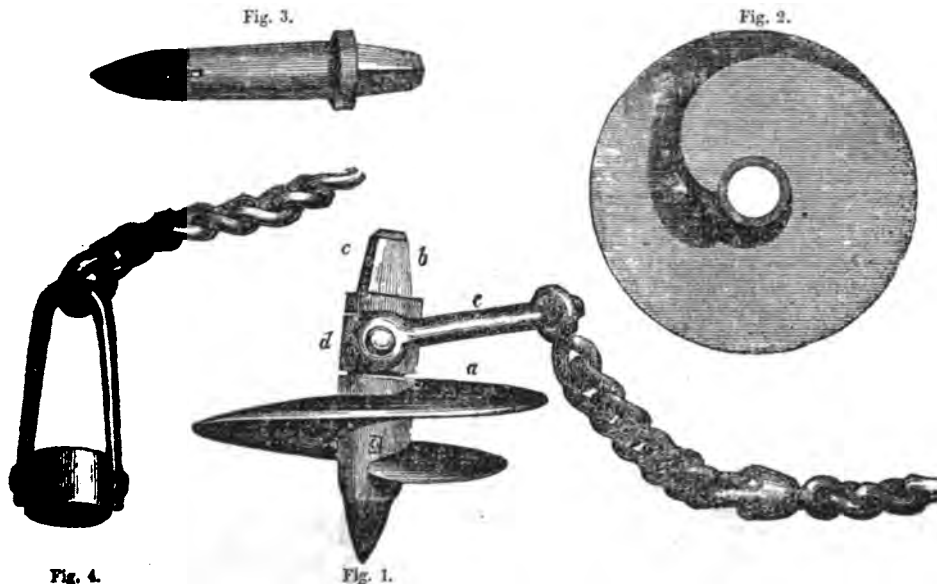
shows the screw mooring as prepared for use. *a* is a spiral or screw flange of about one turn and a half, having a hollow cylindrical centre, as shown in figure 2, and of cast-iron in one piece; *b* is a wrought-iron spindle, which passes through the cylindrical socket of the screw flange, somewhat tapering in form, as shown in figure 3, and when driven up tight, is fixed thereto by a forelock, which passes through both; it is formed with a square head, *c*, to receive the key for screwing it into the ground; *d* is a collar of
